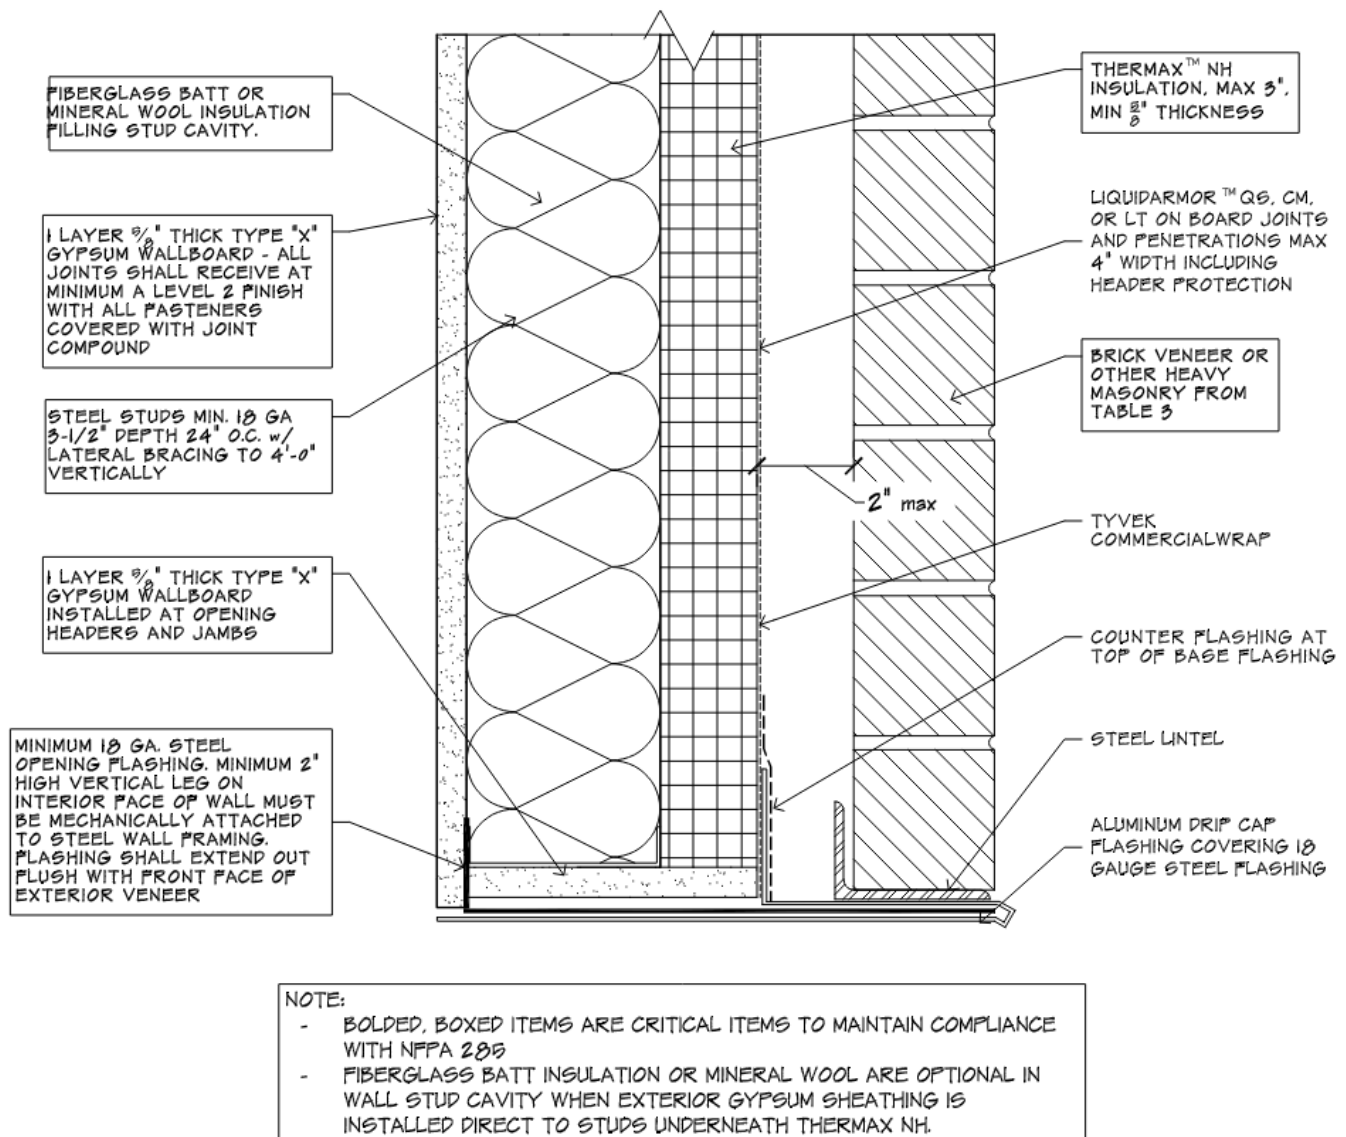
Exterior wall construction with brick exterior veneer (depicts exterior veneer systems other than Hardie® Plank where air cavity space exists between insulation and exterior veneer)
